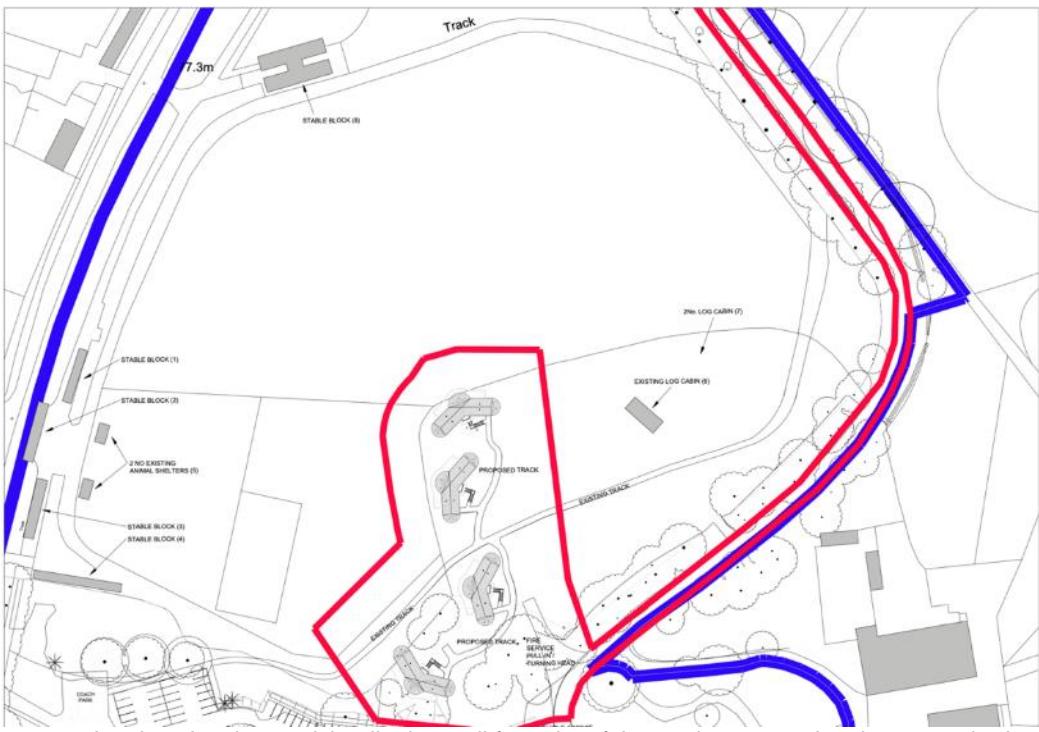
site plan showing a misleadingly small footprint of the treehouses and various unauthorised or temporary buildings
